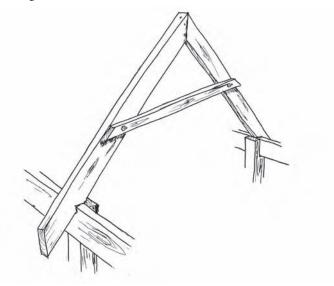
Collar tie bolted to the rafters to create a barn shaped ceiling
